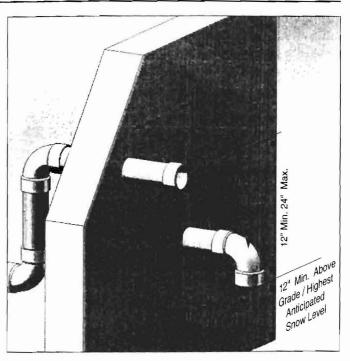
Direct Vent - Alternate Sidewall Termination of Vent and Combustion Air Piping
